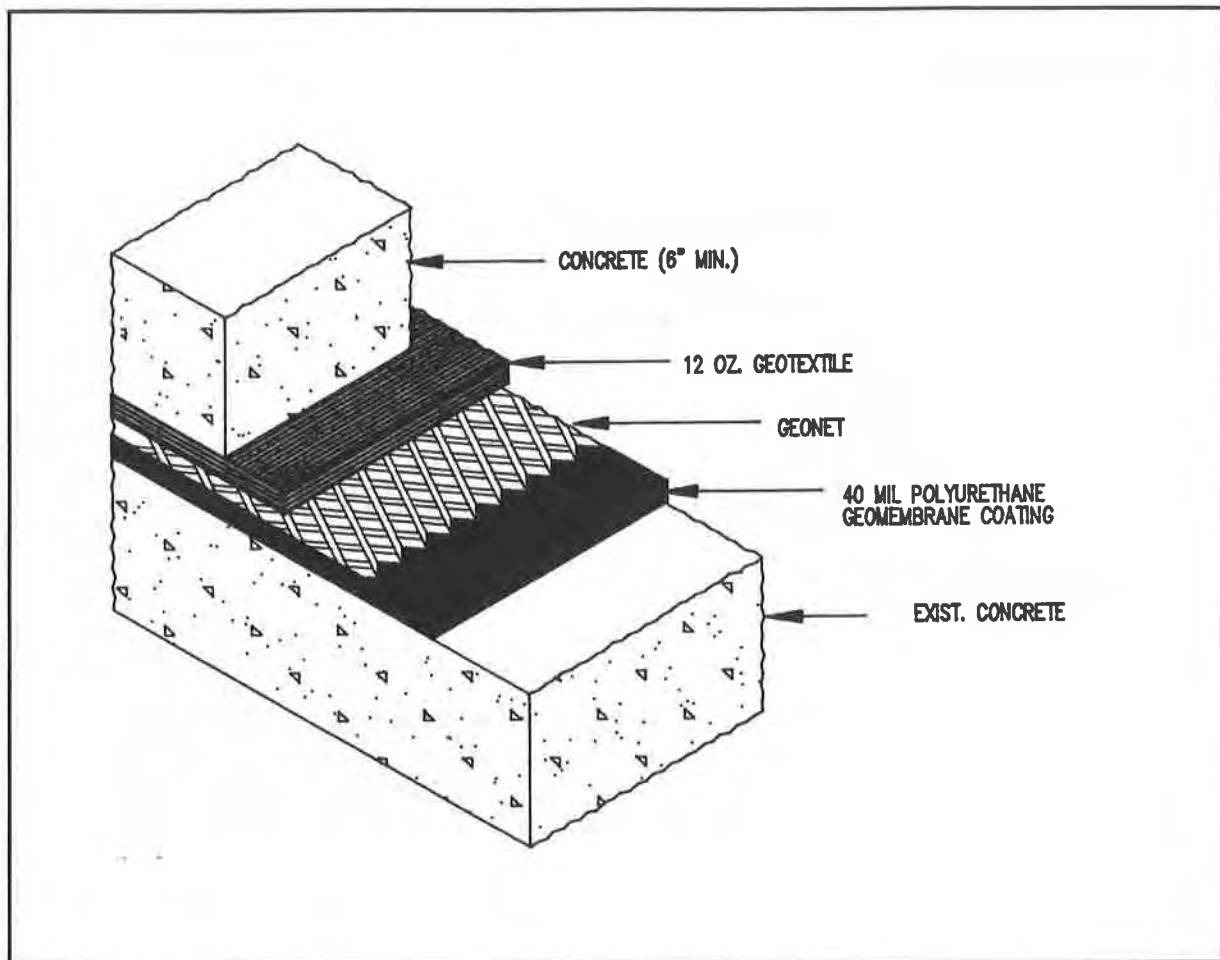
TYPICAL DETAIL OF CONCRETE ON EXISTING PAVEMENT USING SPRAY-APPLIED GEOMEMBRANE
